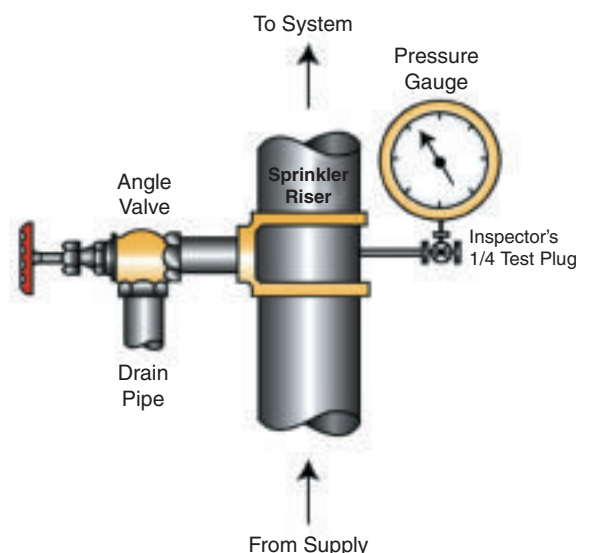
Diagram of typical main drain arrangement on a sprinkler riser
